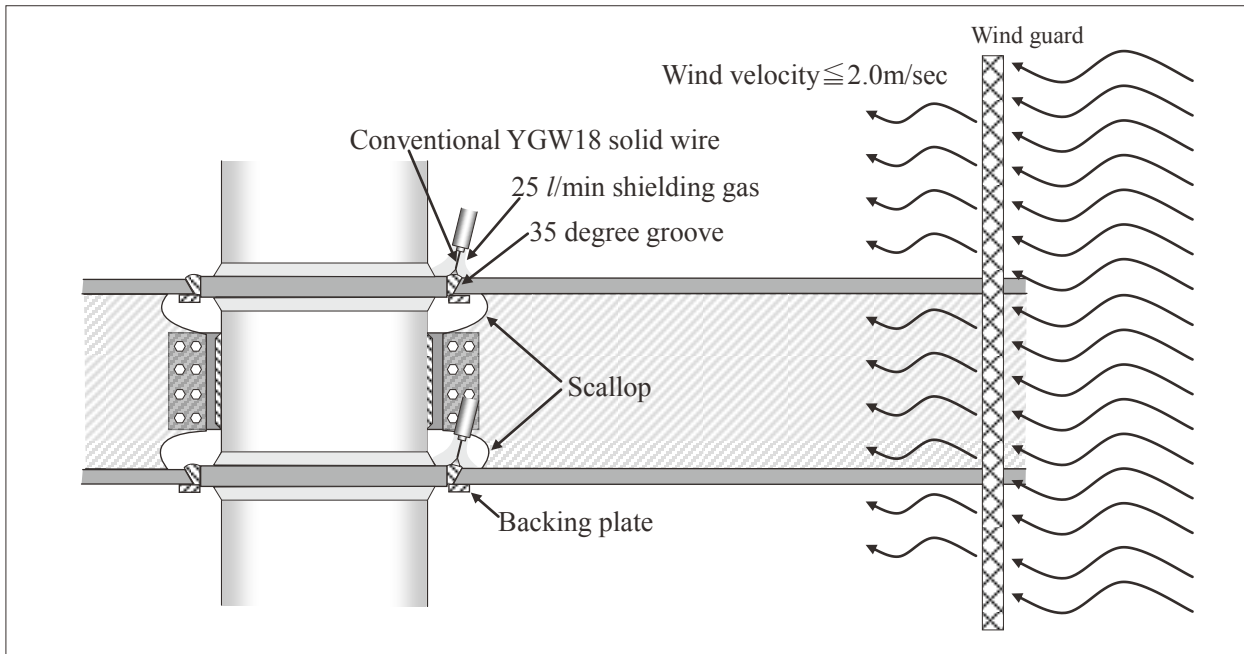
Conventional design, welding wire and management for on-site
